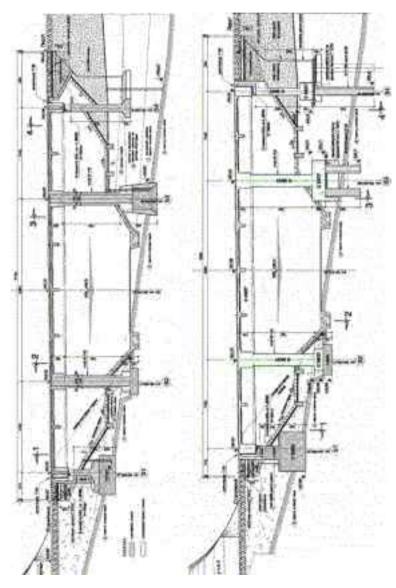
Longitudinal profile of the existing bridge and the newly-designed bridge
